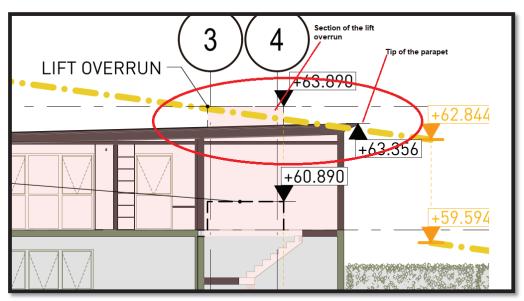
Cross section of the building illustrating the height limit (yellow dash line) and extent of lift overrun and parapet/eave variation.
